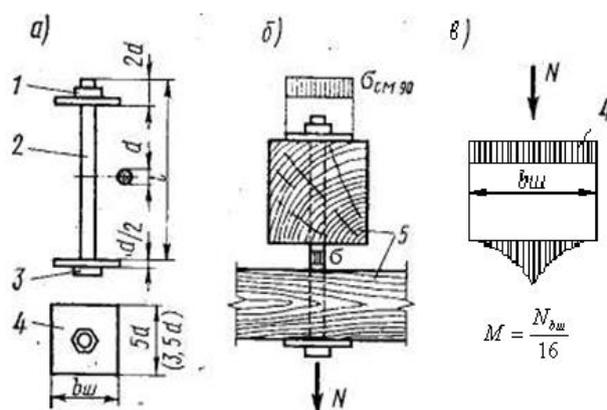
Stretch bolts: a - general view; b - bolt and wood scheme; c - washer scheme; 1 - nut; 2 - rod; 3 - head; 4 - washer; 5 - elements to be connected
